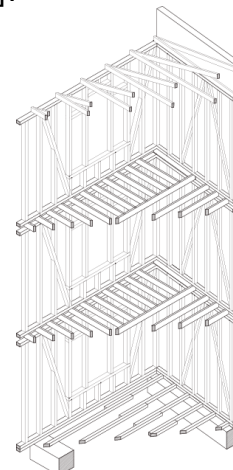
3D section of an adobillo structure house in valparaiso [13]
